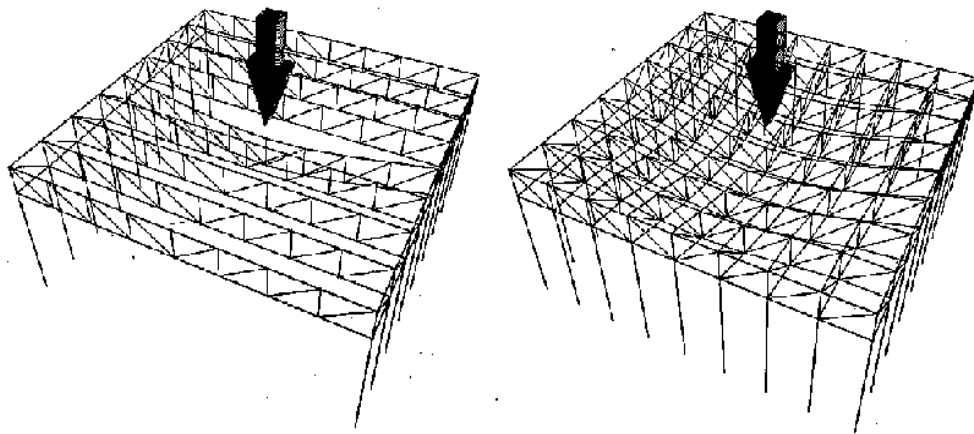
Deflection of planar trusses and a space structure under concentrated loads (Chilton, 2000, p. 13)
